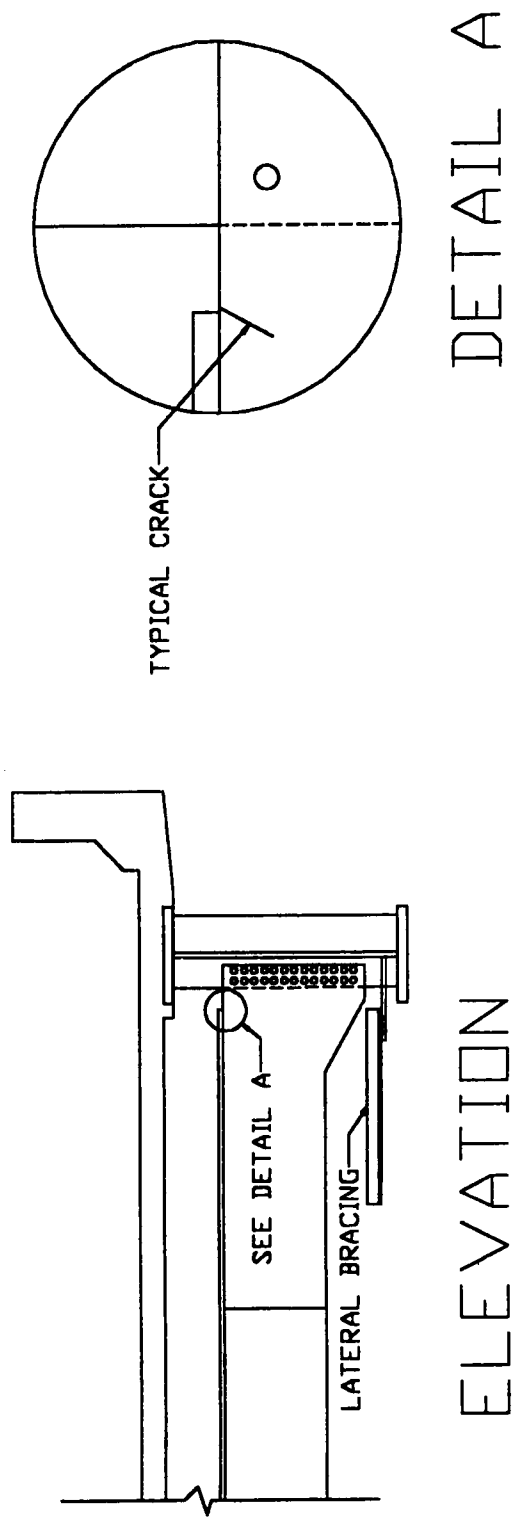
Typical floorbeam-girder connection and resulting crack orientation.
